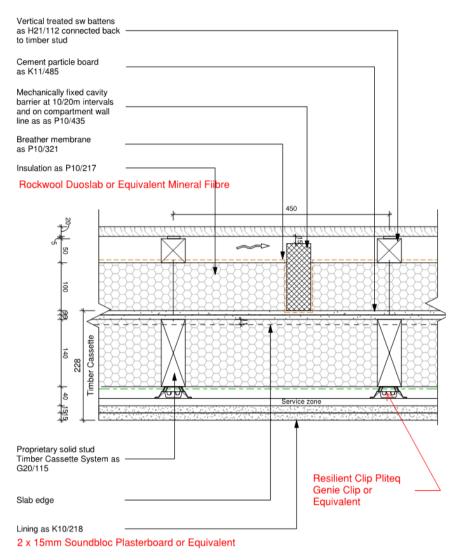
Enhanced Wall Building Up - Alec French Wall Type EW01
